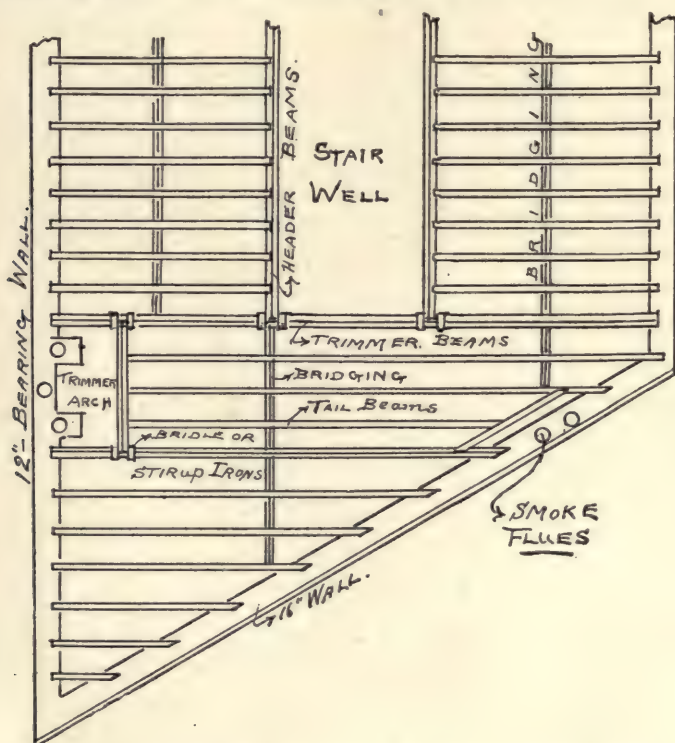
Framing Plan of a Brick House with a Sloping Front.
